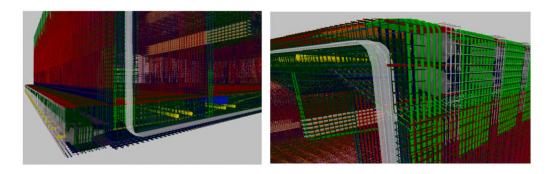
Transverse reinforcement detailing for floor and base slab (Putten and Os, 2022)
